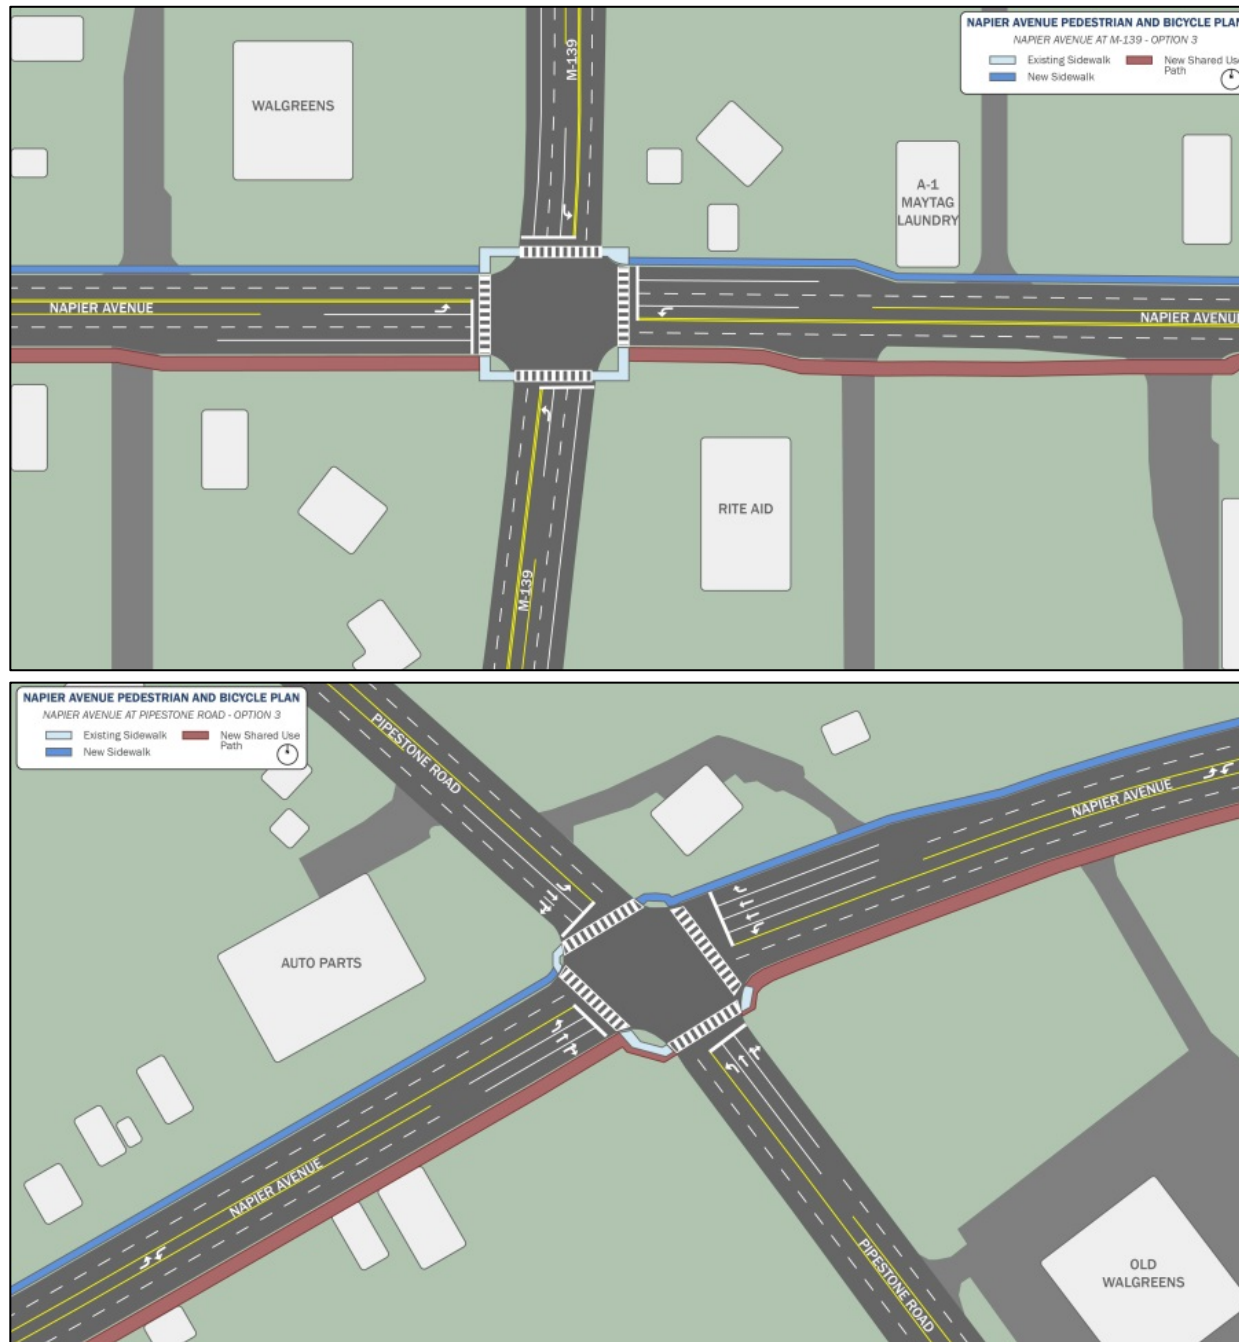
M-139 - Pipestone Preferred Alternative - Plan View
